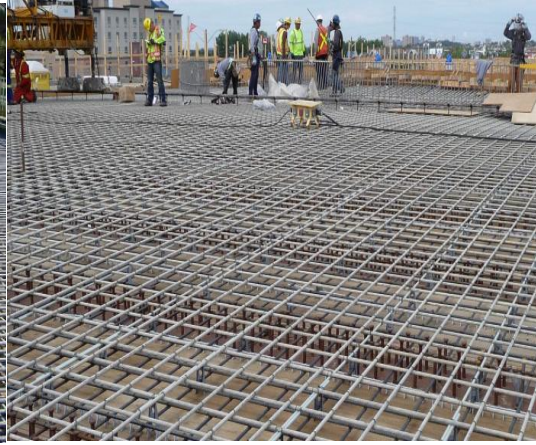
GFRP reinforced-concrete bridge deck (Edmonton, AB)
